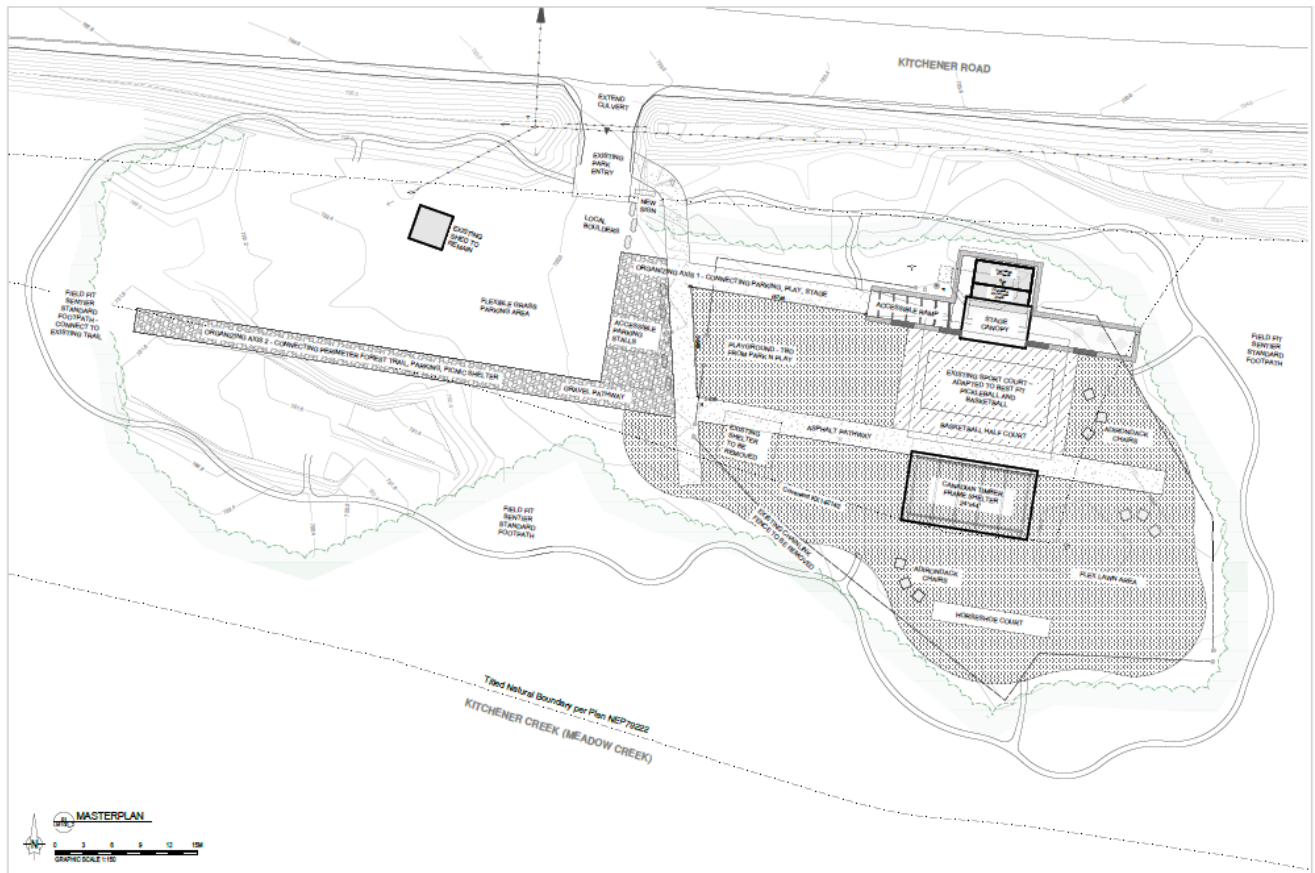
Site Plan showing proposed development (Note: large scale site plan included as Attachment 'B')
